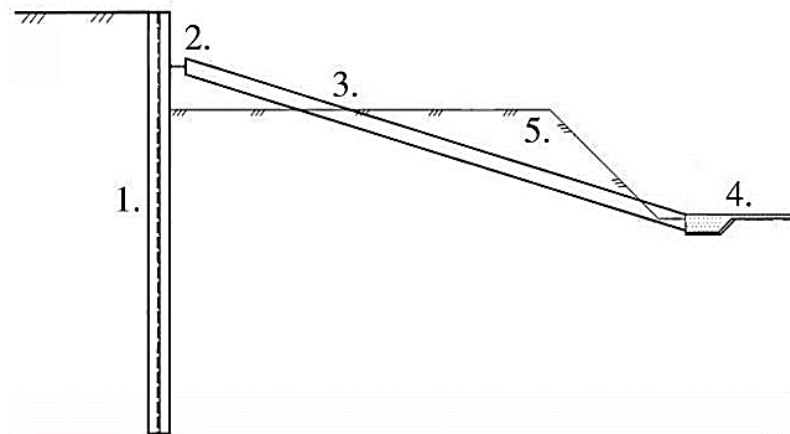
The different components of the excavation in the Tennet 2 project. 1) Sheet pile wall 2) Waling beam 3) Prop 4) Casted concrete 5) Berm.
